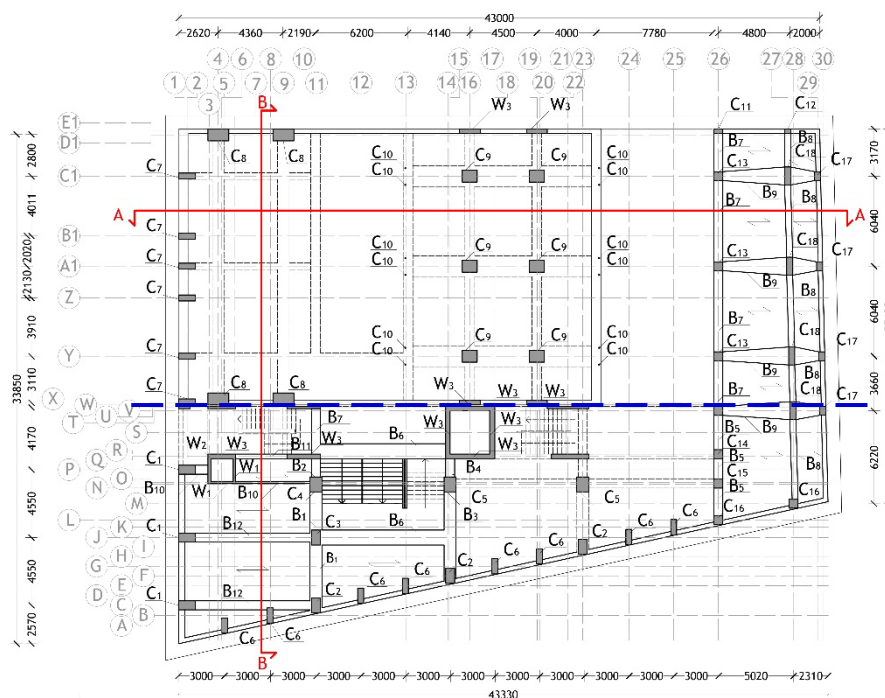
Structural plan of the ground floor (height 0.00 m from ground level)
